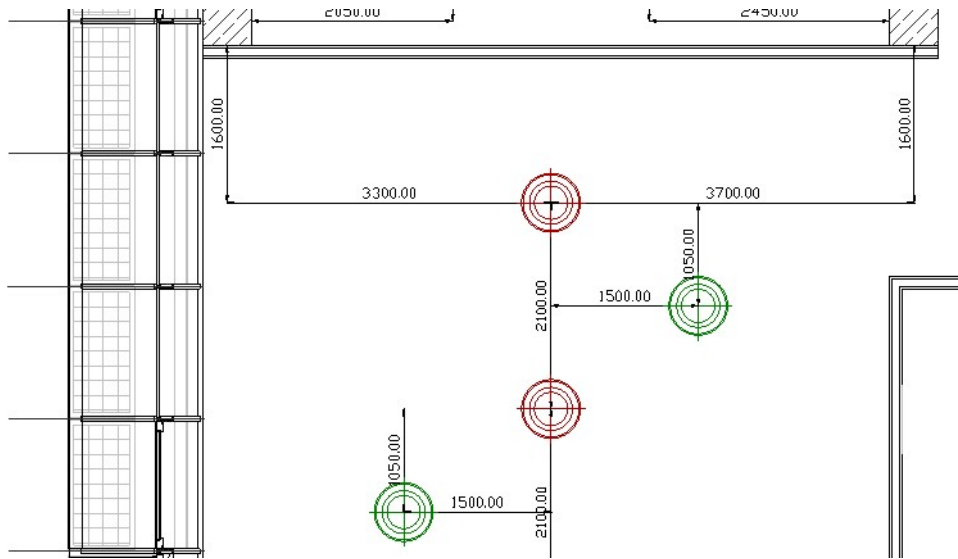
Particular drawing in autocad about the diffusers displacement
